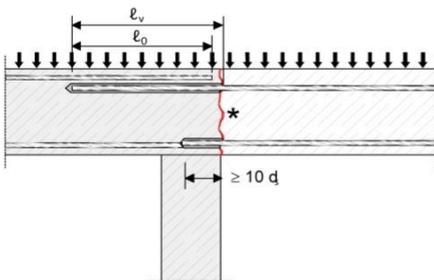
End anchoring of slabs or beams, designed as simply supported.
